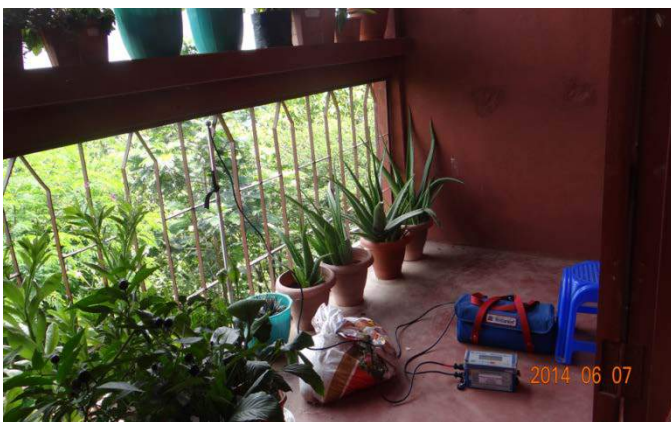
View of vibration monitoring point on the 1<sup>st</sup> floor of an adjoining residential house at Ch: + 400 m blasting location
